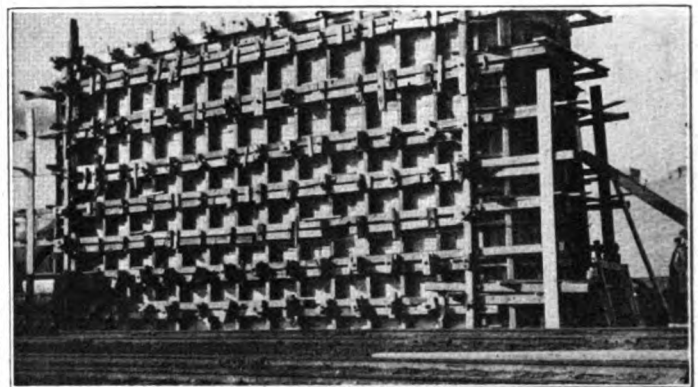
Forms for Erection of Concrete Pier Under "High Line" Elevated Tracks for Connection of Kansas Lines Into the Kansas City Terminal.
